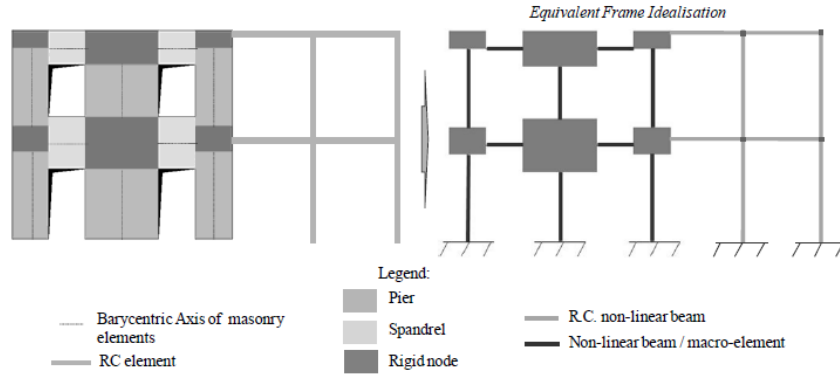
Example of mixed RC-masonry structure with the corresponding equivalent frame idealization (Cattari and Lagomarsino 2013)
